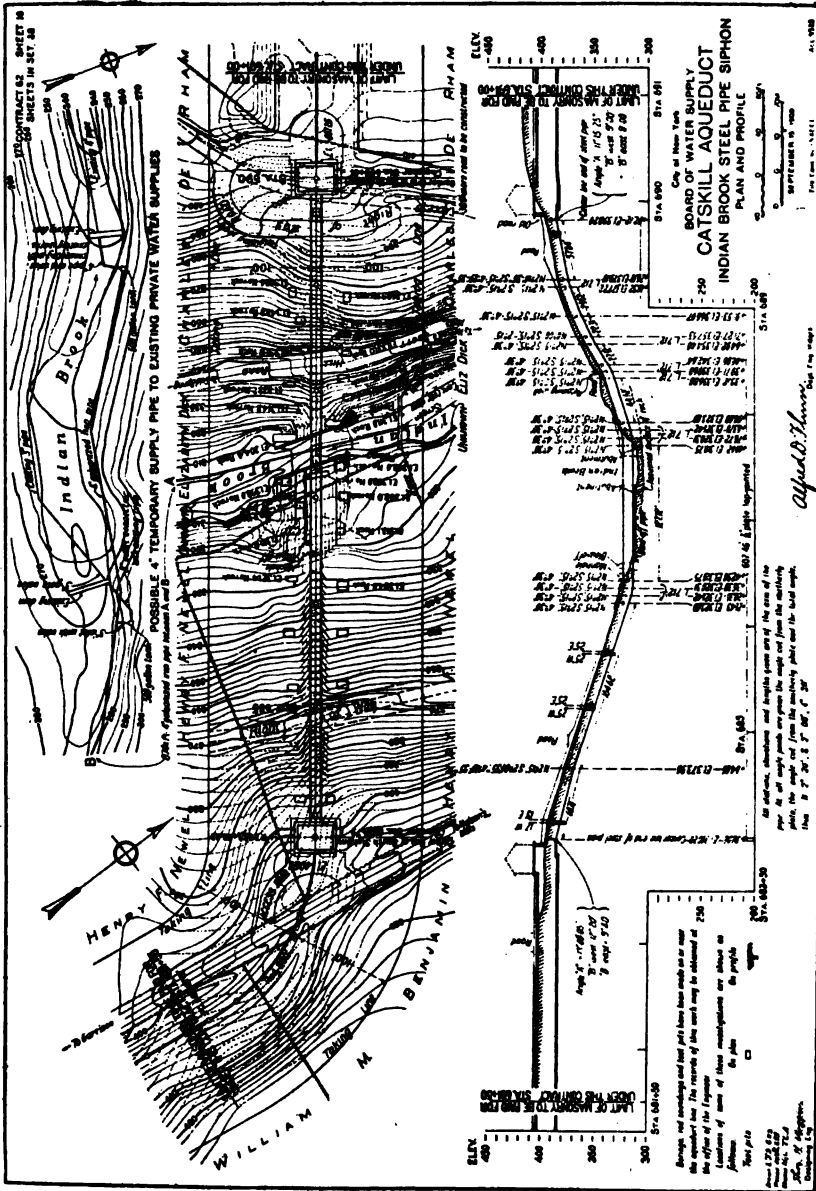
Contract 62. Indian Brook Steel Pipe Siphon. Plan and profile as given in contract drawings.
